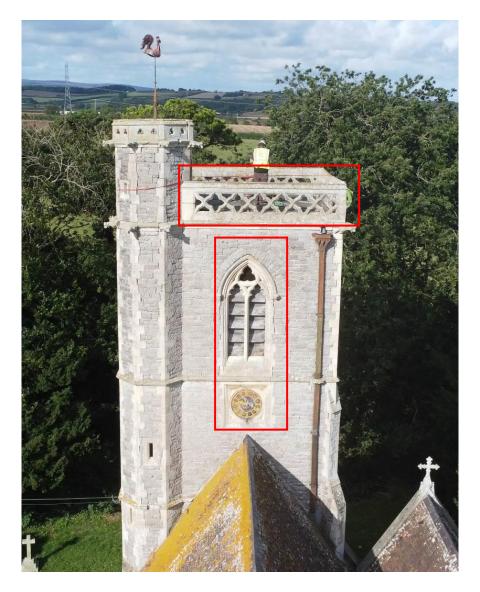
DJI_0193 Locations of Structural Issues in East Elevation
